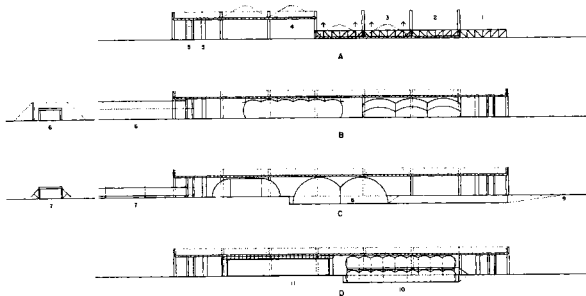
BASE CONCEPT I (see Fig 1). Section A showing erection sequence. (1) Aluminum lattice girders and columns in place (2) Prestressed floors employing moulded regolith components attached at ends to girders (3) Floor loaded with regolith raised by jacks up column guides (4) Regolith leveled off Sections B-D show range of pressurized enclosures shapes and types for different uses under shield. (5) Entry through overlapping radiation barrier walls (6) Shielded link to other part of base Bermed or with walled sides (7) Solar shaded link to other parts of base (8) Large pressurized enclosures for big equipment maintenance. (9) Ramp access to lower levels (Lb) Small pressurized enclosures for agriculture etc (10) Pressurized enclosure (to be developed later) using impervious membranes applied to interior surface of rectangular enclosure. Extra top panels to resist outward thrust of pressure
